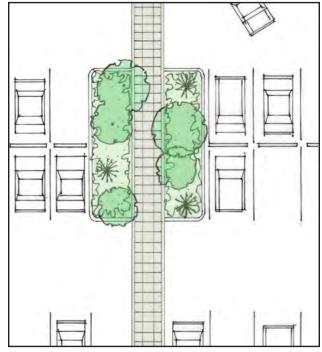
d.4: Minimum 5-foot walkway with scoring
